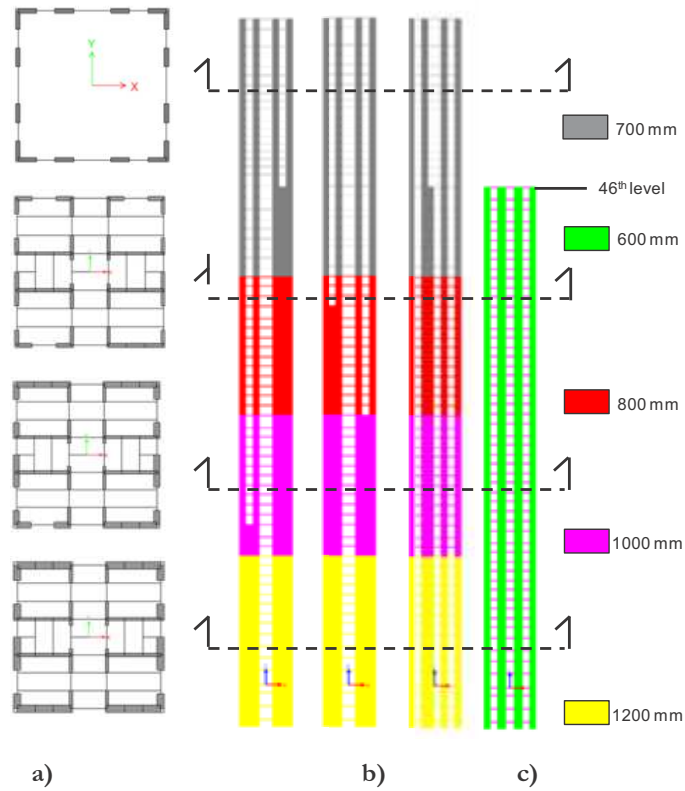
OT1 final design. a) Variation of the central core structural plans along the elevation, b) thickness and geometry of the walls on the core perimeter, c) thickness and geometry of the internal walls
